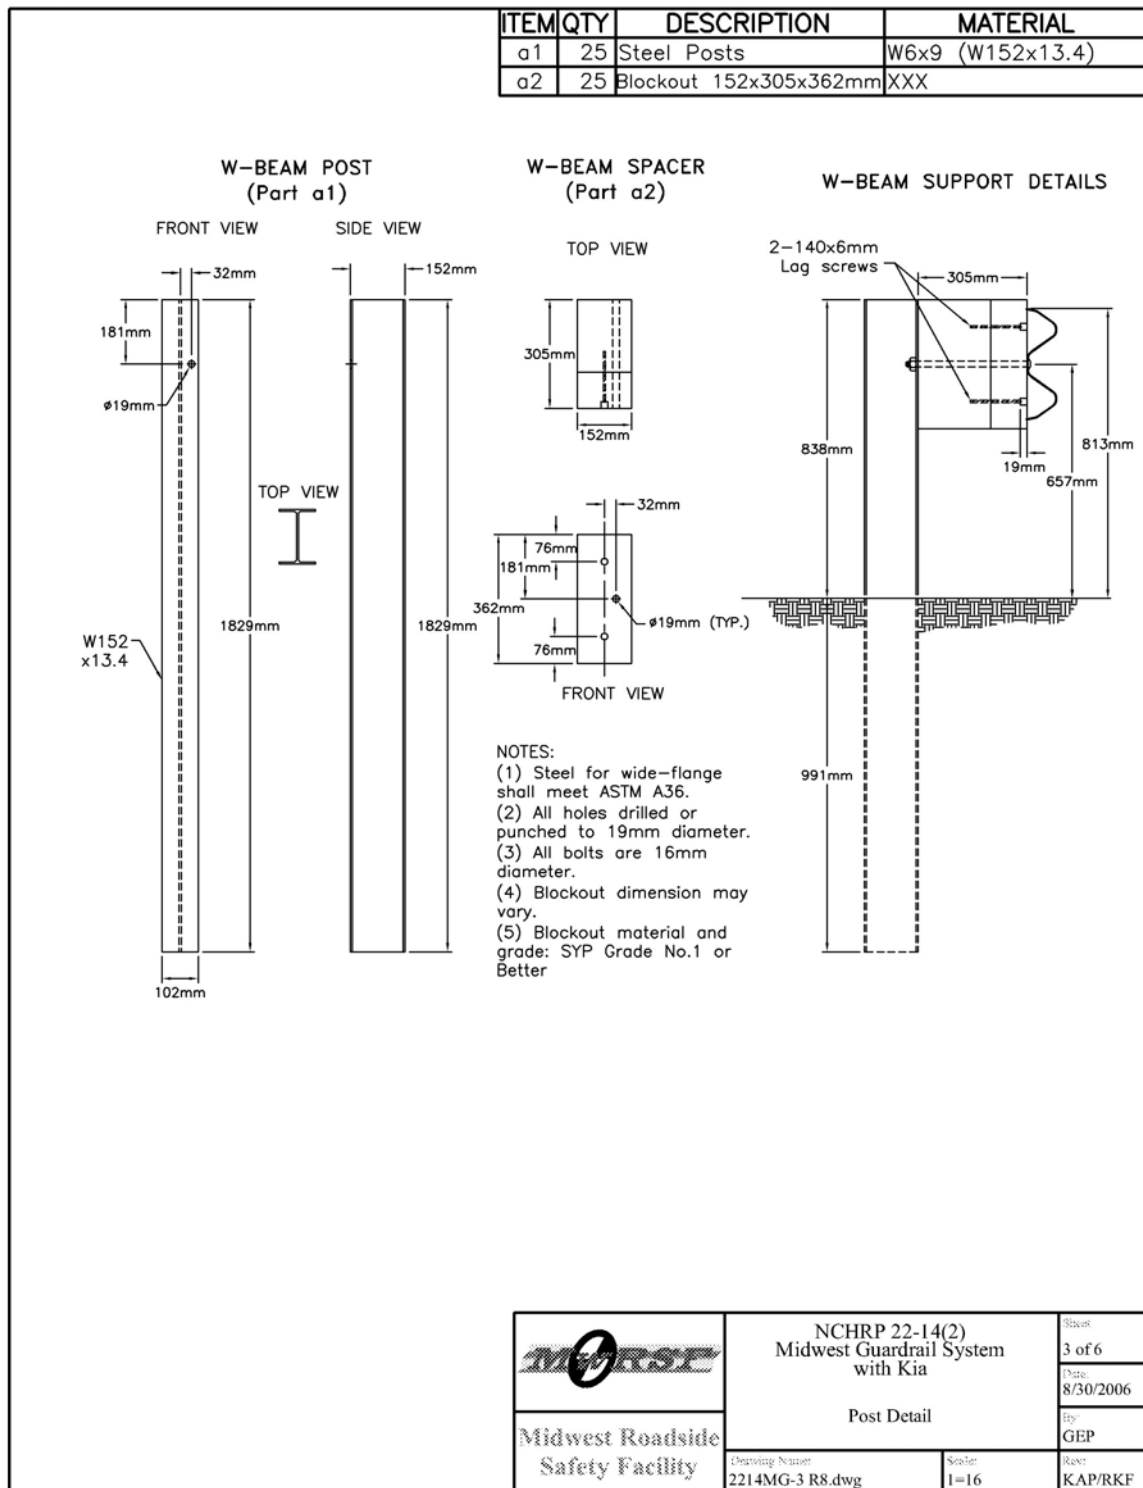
Midwest Guardrail System Post Details - Maximum Height Tolerance
